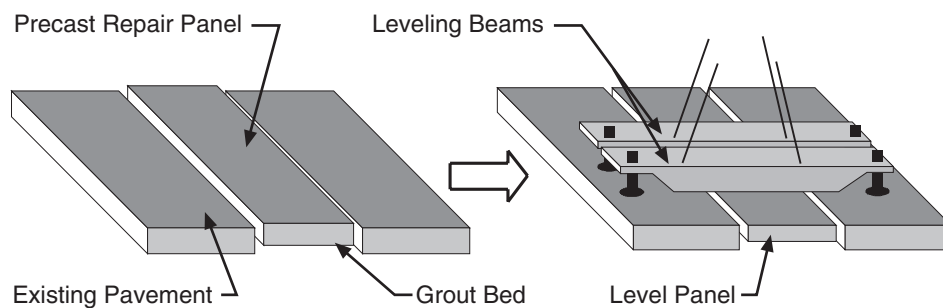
Precast repair panel before and after leveling beams are used to set it into place
